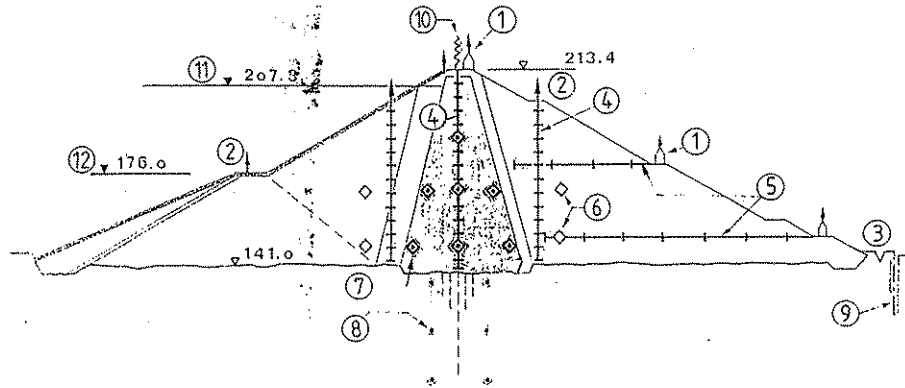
Typical instrumentation of a rockfill dam with earth core (example: Kinda dam, archives LI).
